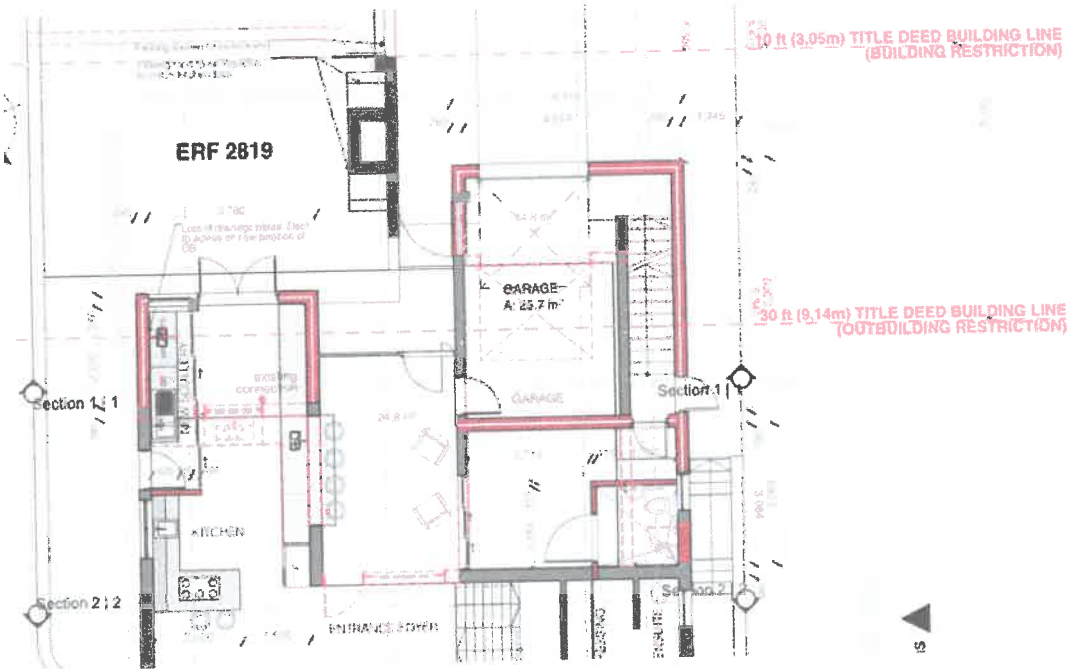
Ground floor layout of new extended garage and disabled room with toilet
